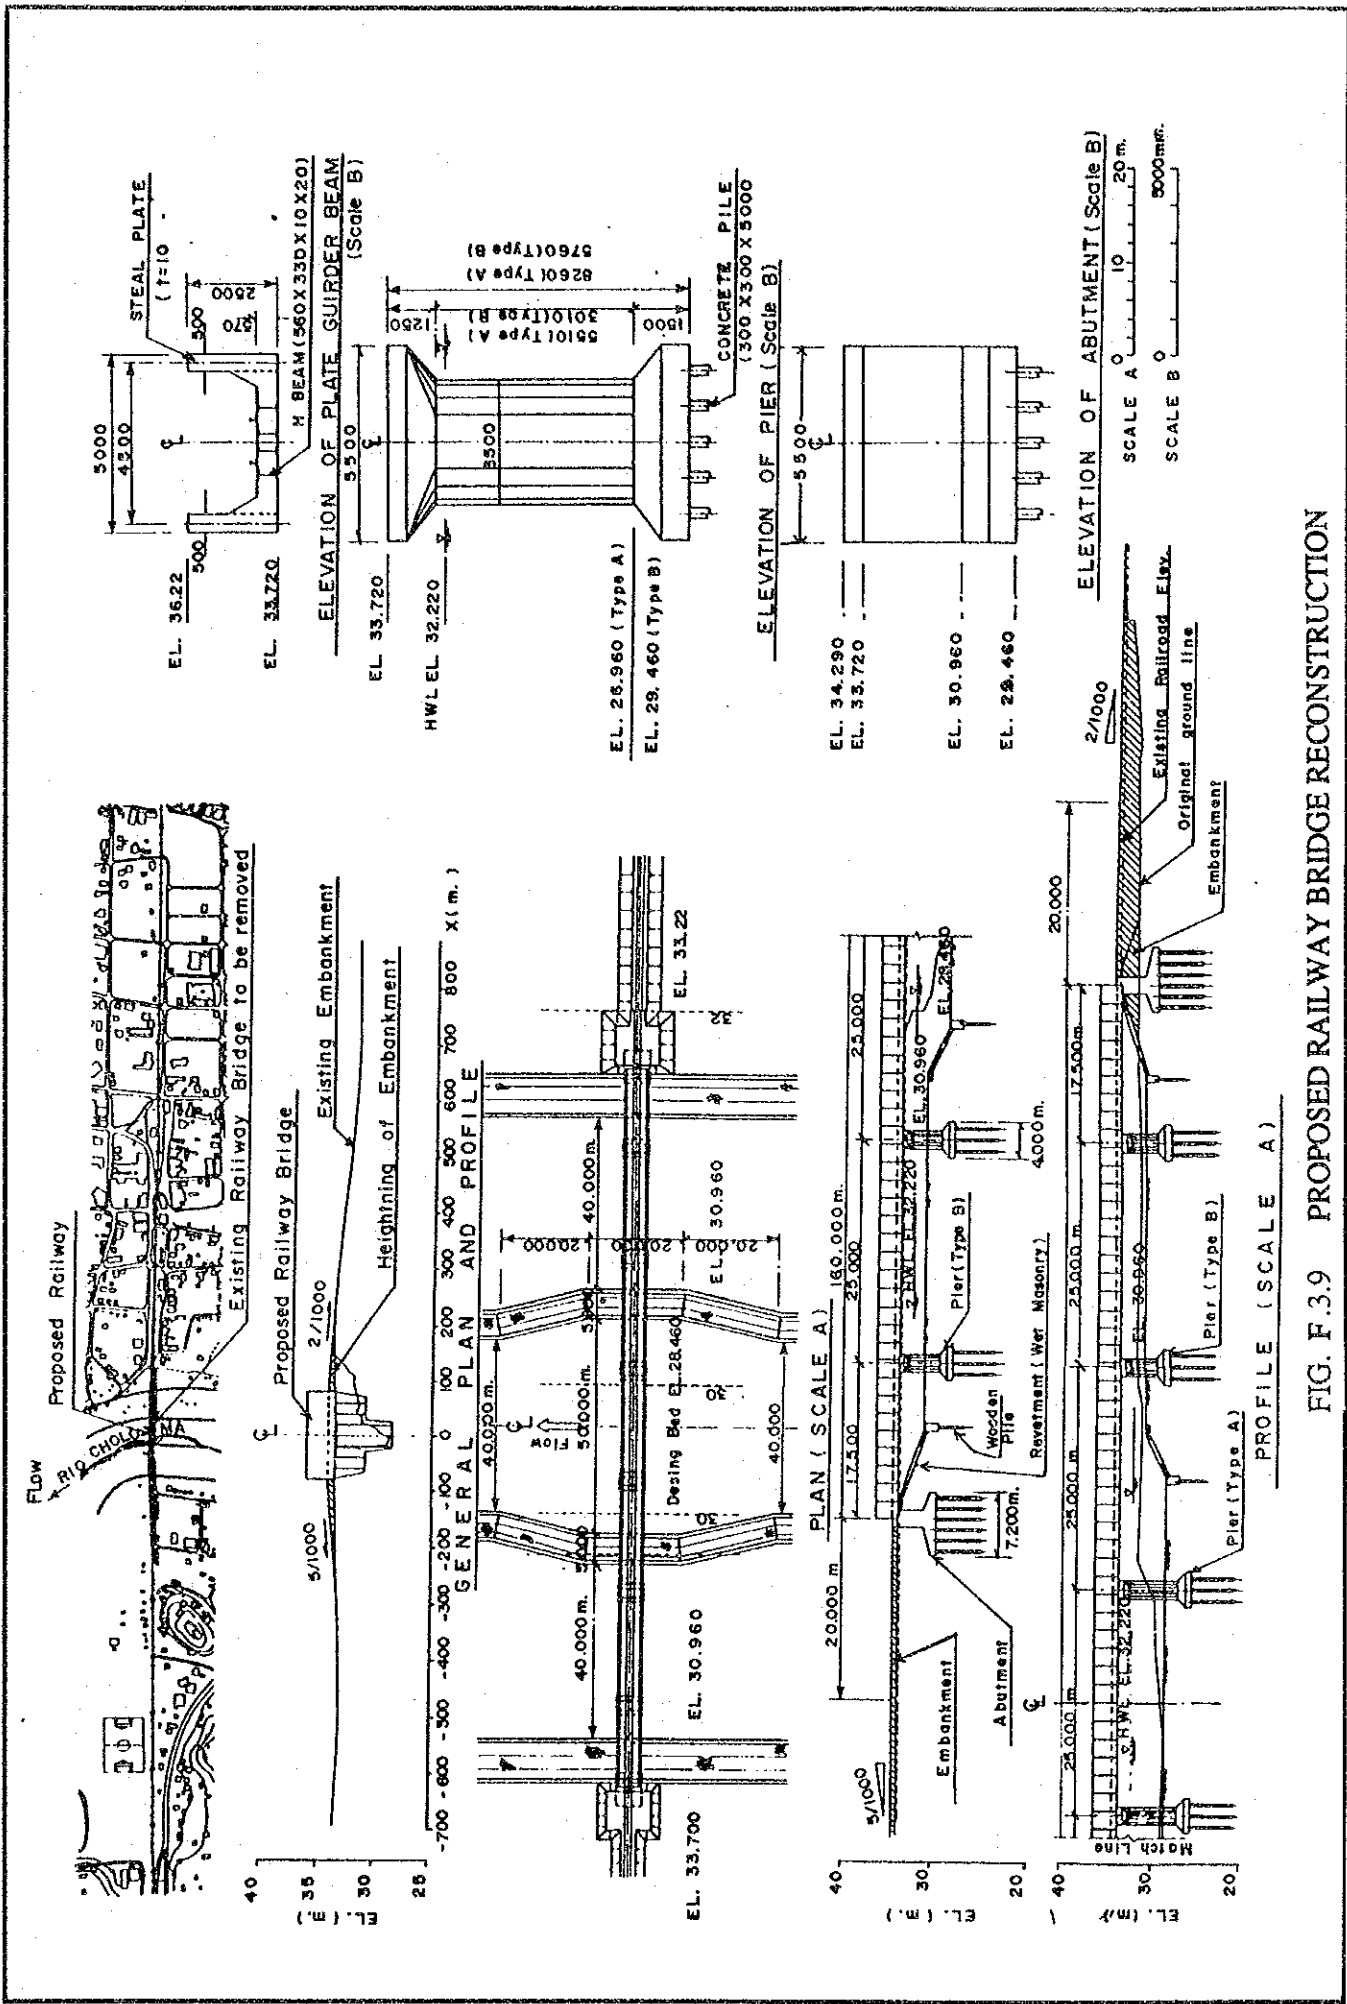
PROPOSED RAILWAY BRIDGE RECONSTRUCTION
